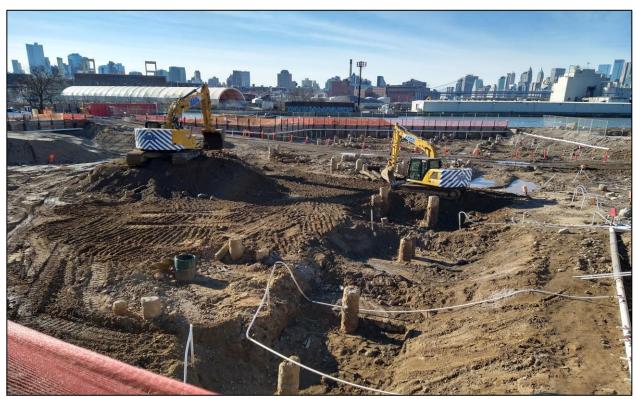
Concrete footing slab and cement piles in northeast portion of excavation area, looking west from Kent Avenue and S. 11th Street.
